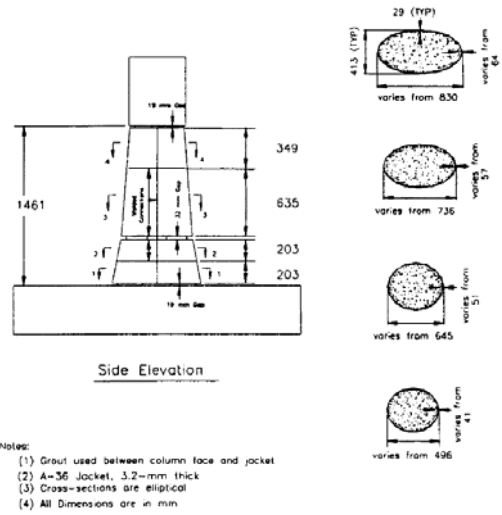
Example seismic retrofitting detail for a reinforced concrete column using a steel jacket [7]
